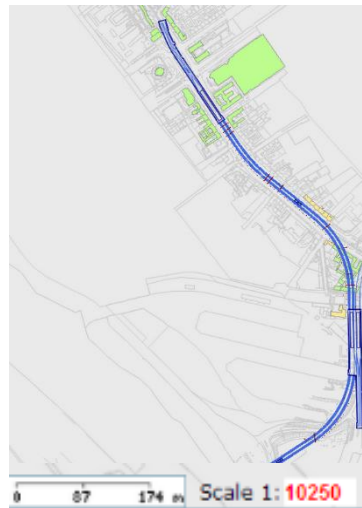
Tunnel leaving C14, turning north and then running under Targowa Street
